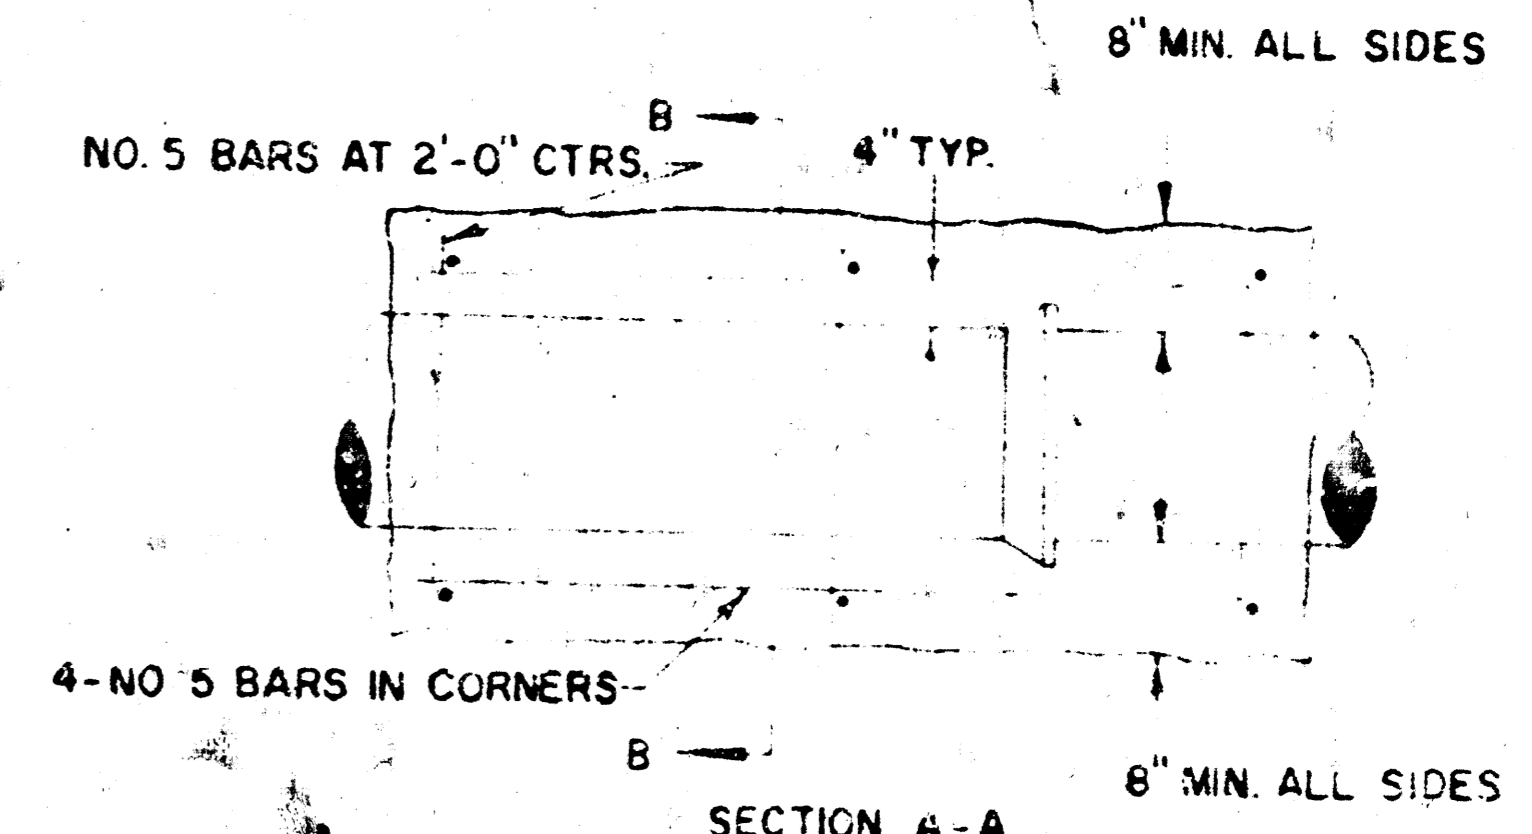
DETAIL OF DROP STACK FOR EXISTING MANHOLES IN GROUND WATER
